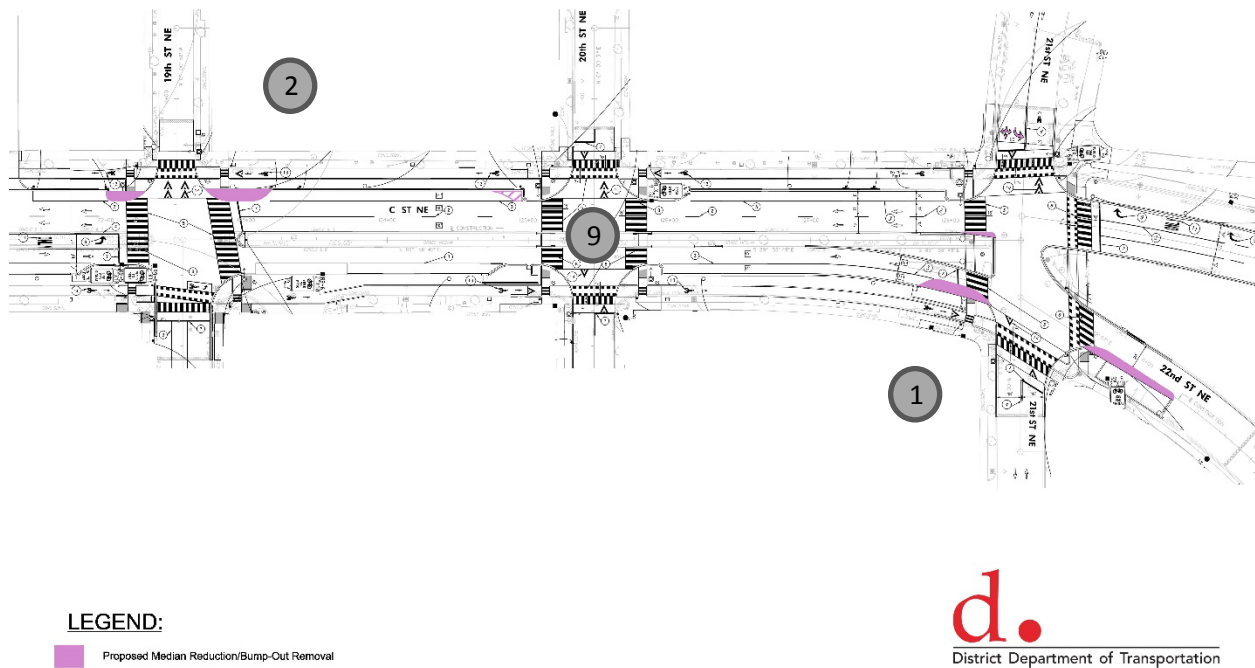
April Modifications to February 65% Design—19th Street NE to 21st Street NE
